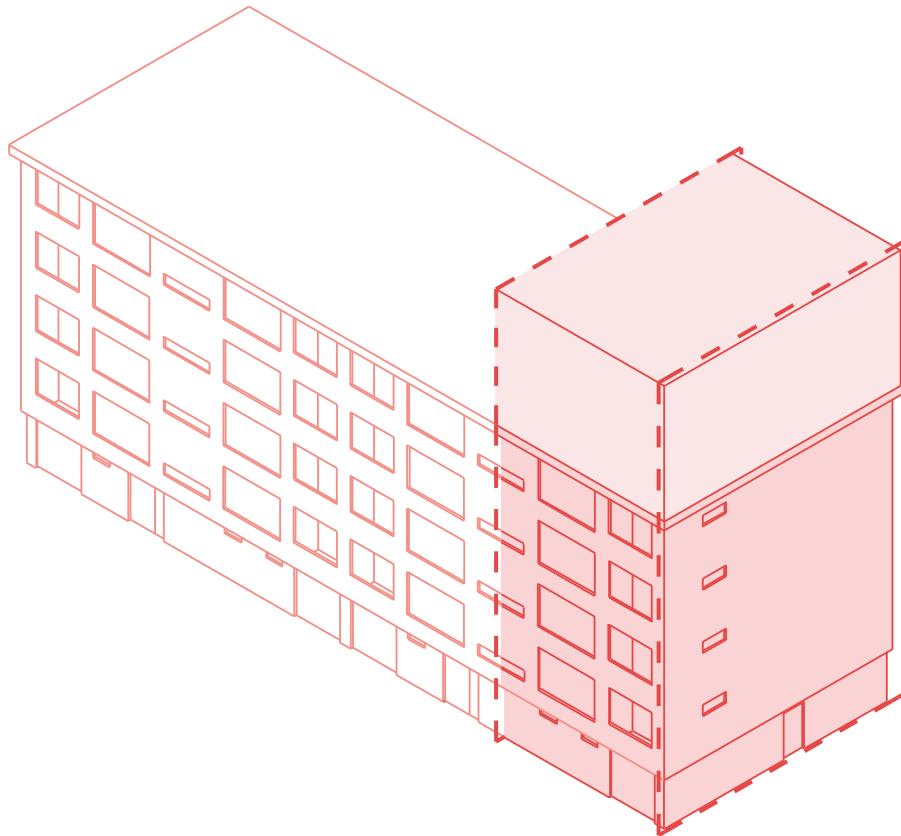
N. Dalman, *width of one apartment of portiekflat which will be used to determine required building elements*, 2023.
